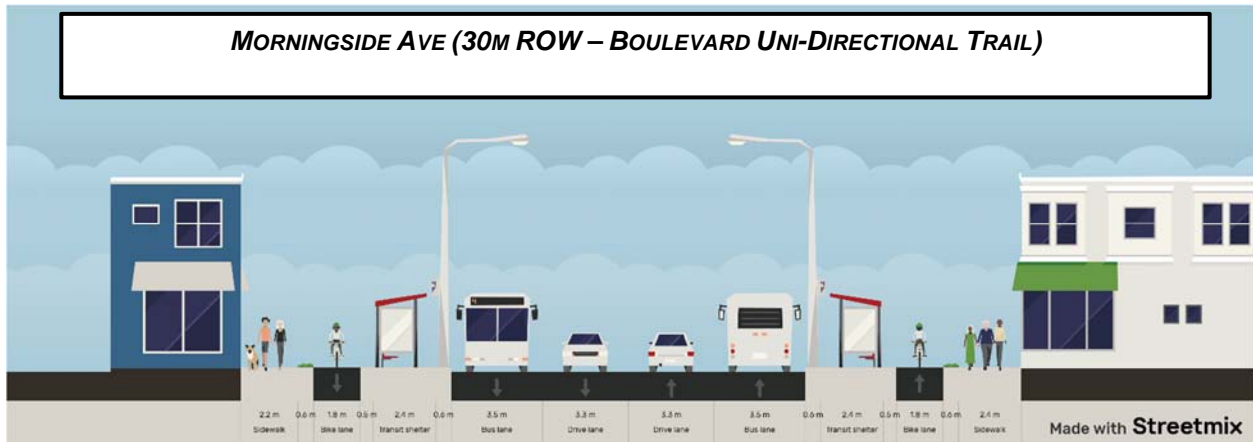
MORNINGSIDE AVENUE – CONCEPTUAL CROSS-SECTION FOR 30-METRE ROW
